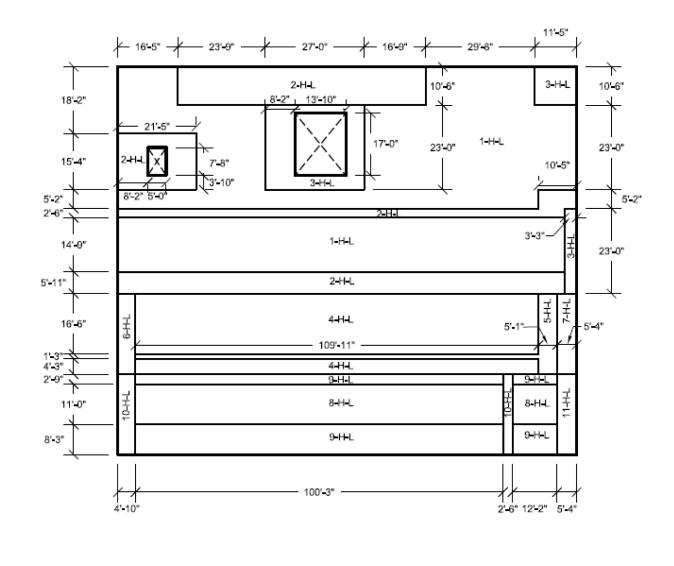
H.3-18 East Wall Looking West Horizontal Reinforcement Zones Near Side Face
